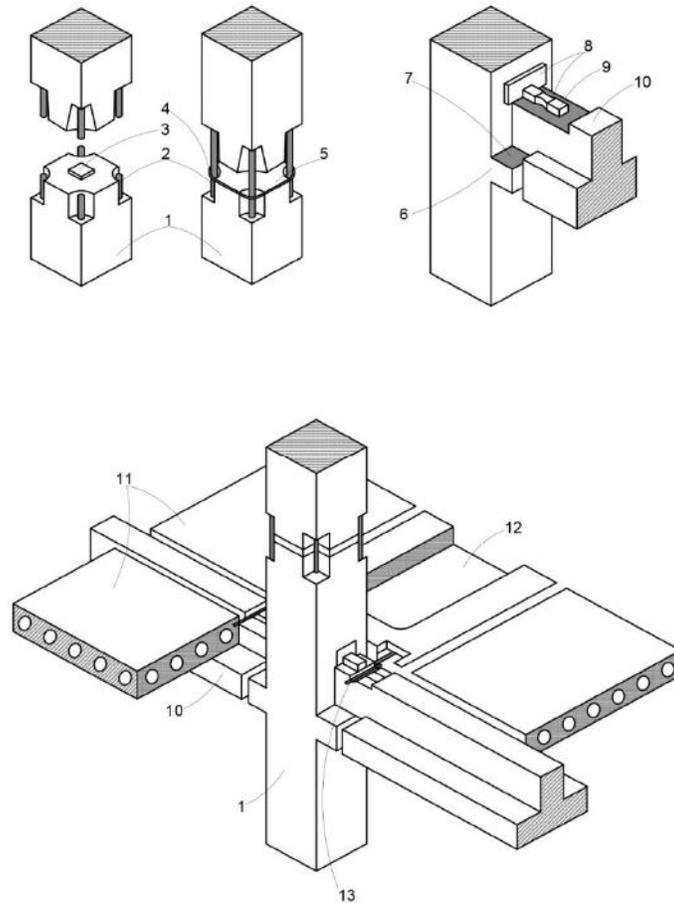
Precast RC frame elements and their connections: 1 – concrete column; 2 – free length of reinforcement; 3 – concrete corbel; 4 – steel link; 5 – grouted joint; 6 – concealed column cantilever; 7, 8 – built-in items; 9 – steel splice piece; 10 – concrete beam; 11 – floor slab; 12 – column (braced) slab; 13 – steel tie.
